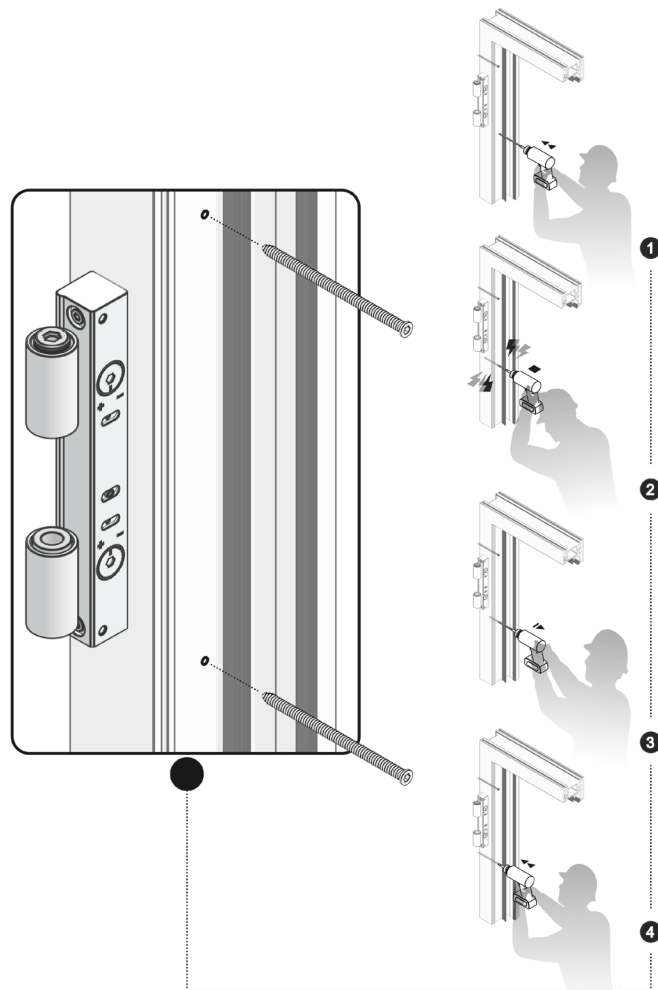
Fastening Door (88TS Outswing) Frame to Rough Opening
